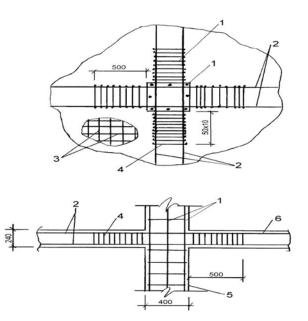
Structure of monolithic beamless covering: 1 - longitudinal reinforcement of the column: 2 - additional reinforcement in the slab under the column; 3 - slab upper and lower reinforcement meshes with a rod diameter of 100 mm (conditionally not shown on the section); 4 - clamps with a diameter of 8 mm and pitch of 50 mm; 5 - a column with a section of 40x40 cm; 6 - floor slab.
